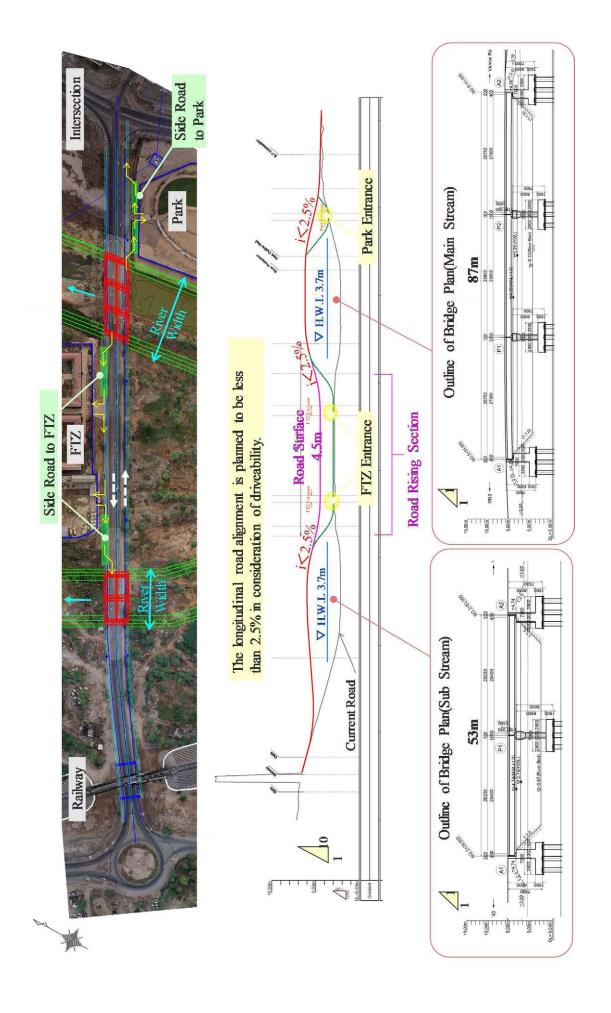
Outline Drawing of the Countermeasures (Alternative 3: Main+Sub-stream Improvement)
